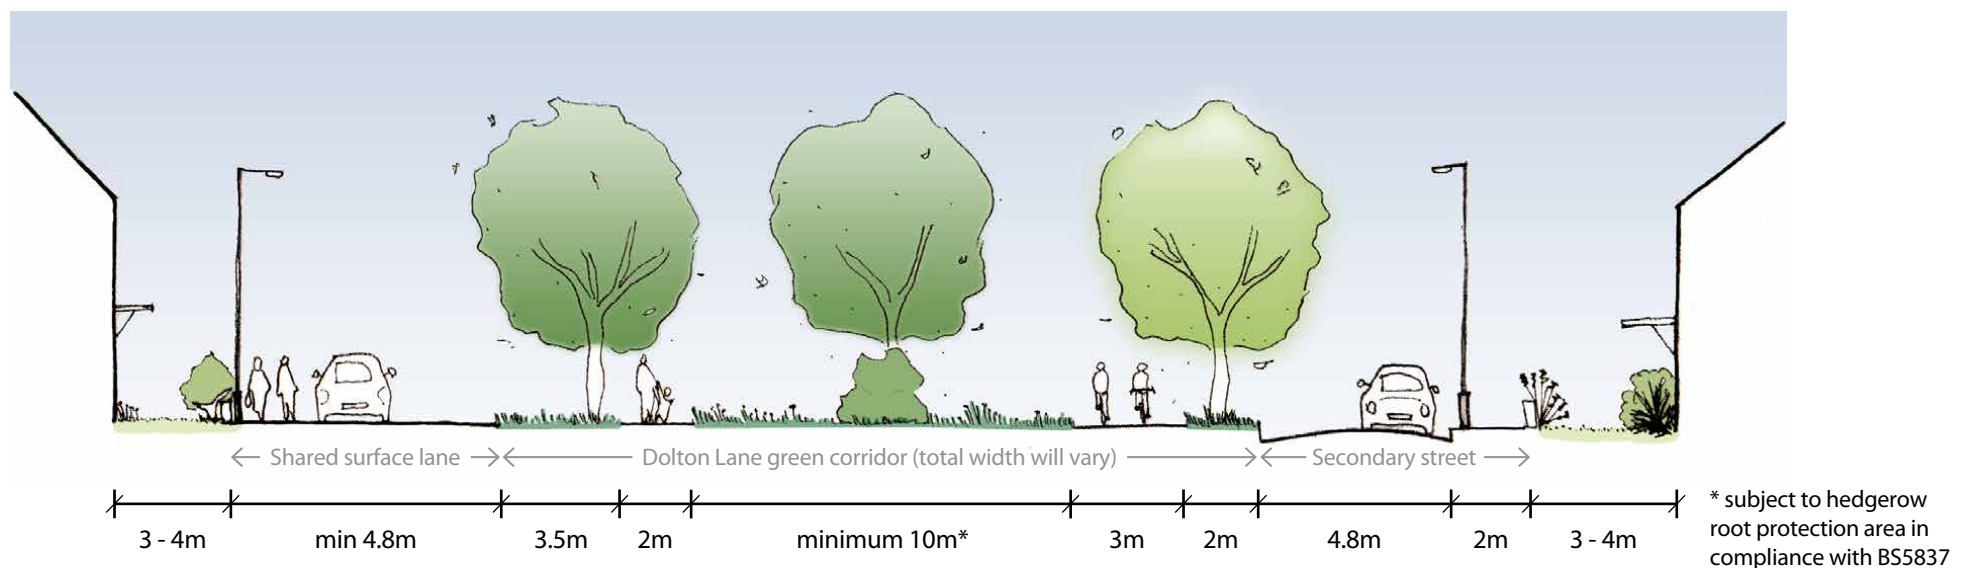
B-B – typical secondary street cross section showing relationship to Dolton Lane green corridor (refer to Fig. 15 for section location)
